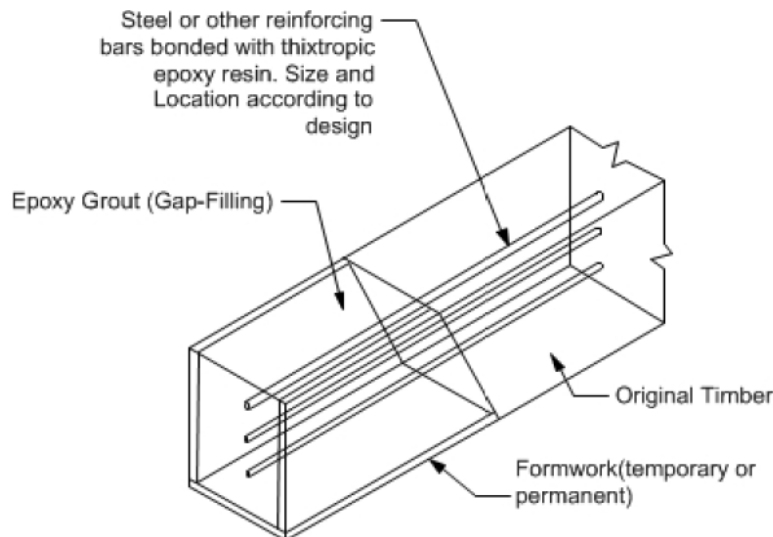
Typical beam end repair with epoxy as gap-filling and embedded reinforcement for transferring the structural load from sound wood to the epoxy [31, p. 56].
